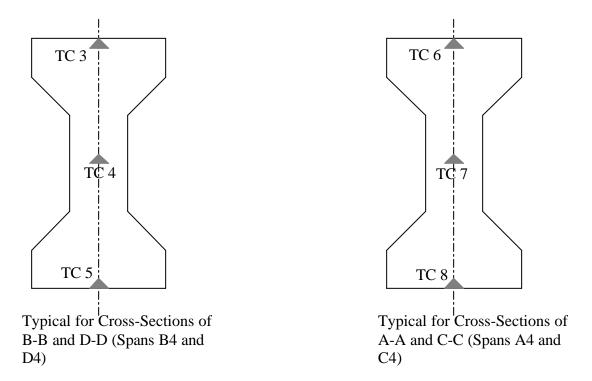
Retained Thermalcouples Of Girder Cross-Sections Along Girder-line 4
